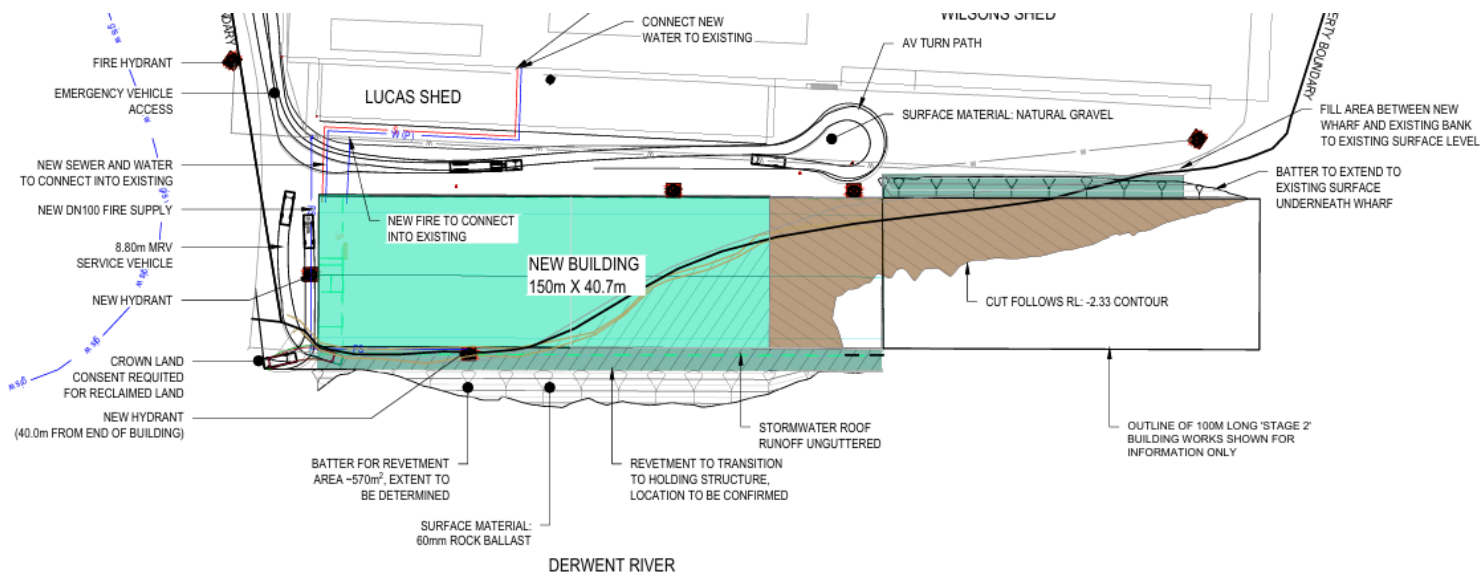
Cropped screengrab from JMG Civil Works Site Plan (provided by D. Gray, pers. comms., 10 January 2026) displaying proposed building and walkway locations (teal). Note that some components in the above plan have been determined irrelevant for the marine ecological assessment, including the “Stage 2” Building Works outlined on the right. It was confirmed that no dredging or excavation works are involved in the project for which the ecological assessment herein addresses (i.e., area that indicates CUT in the image above does not imply excavation- at least not for this project) (pers. comms., S. Casey, Incat CEO, email dated 2 February 2026).
